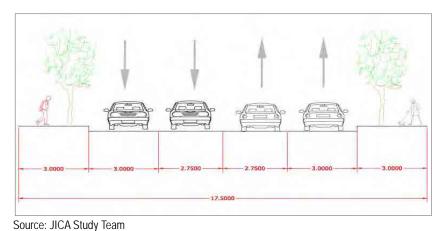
Typical Secondary Road Cross Section (RUT 1-3-3 (2), Qemal Guranjaku Road)
